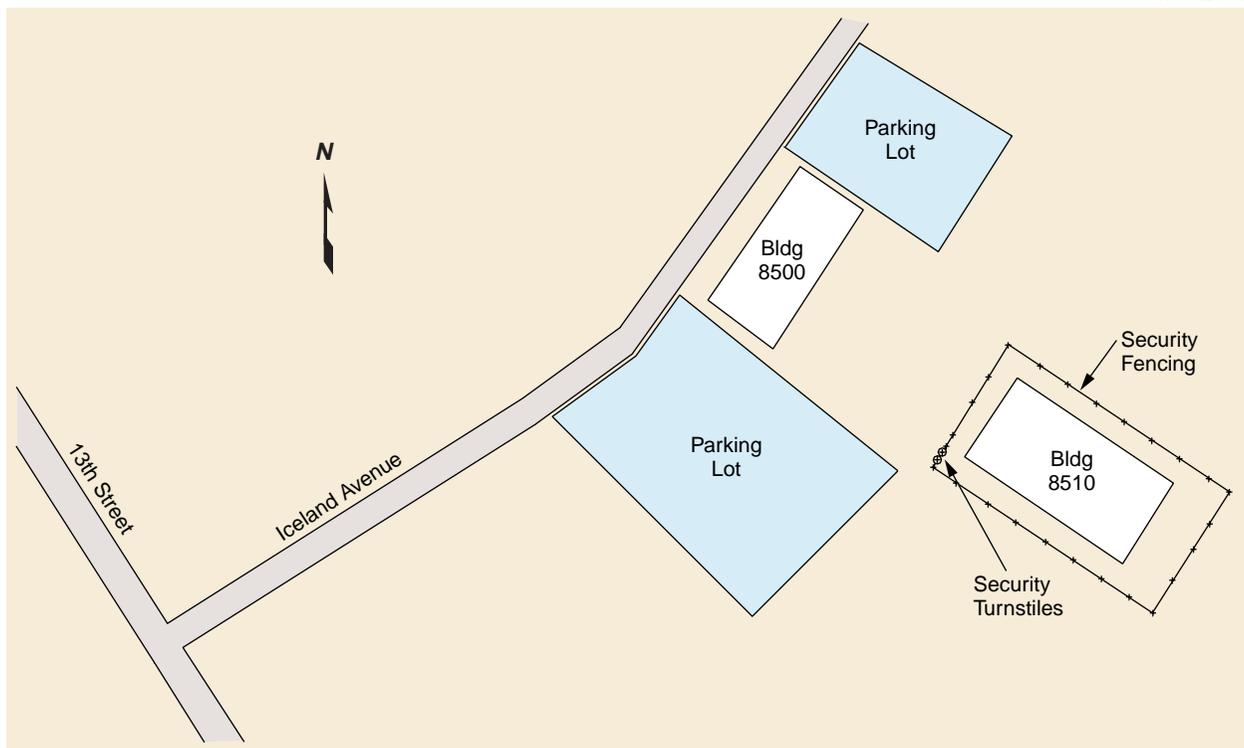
Launch Control Center (Building 8510) Site Plan
